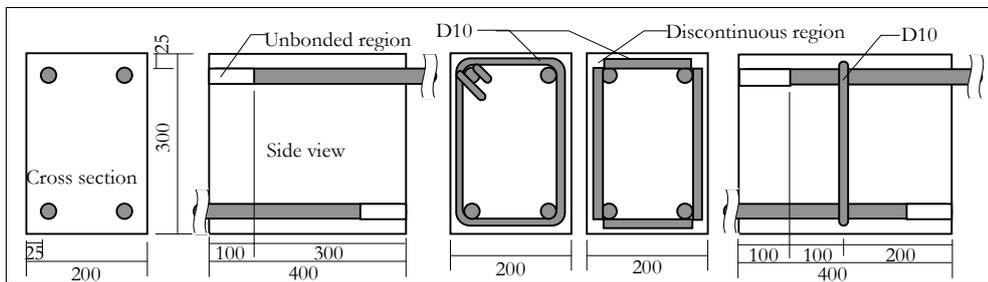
Shape and dimensions of D19 pull-out specimen (dimensions in mm).
